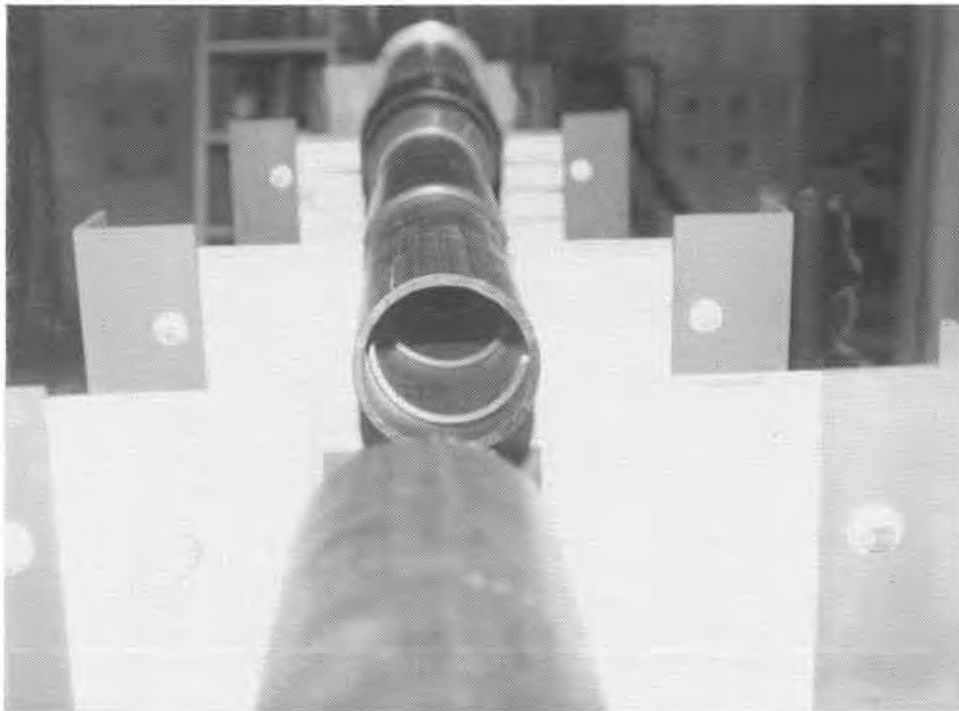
Steel helical spacer inserted in polyethylene stay length
